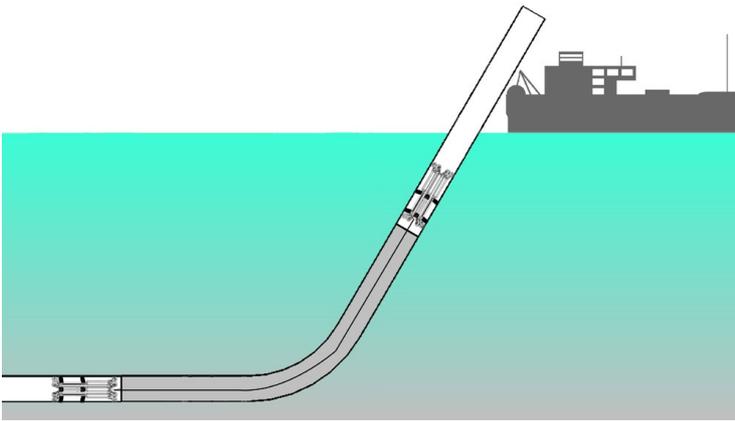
A new length of pipe has been welded, the barge advanced and a new pipe section has been laid on the sea bottom.
